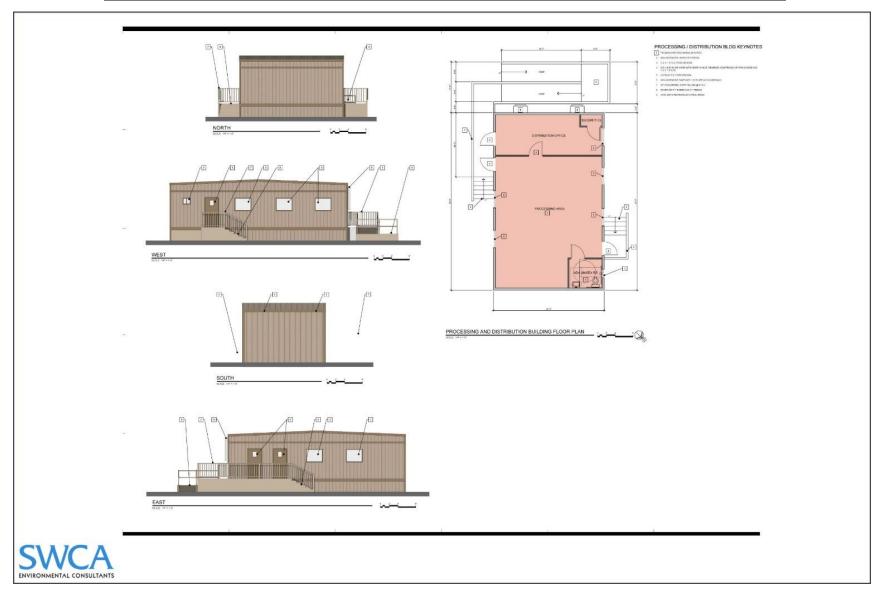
Processing/Distribution Building Floor Plan and Elevations
